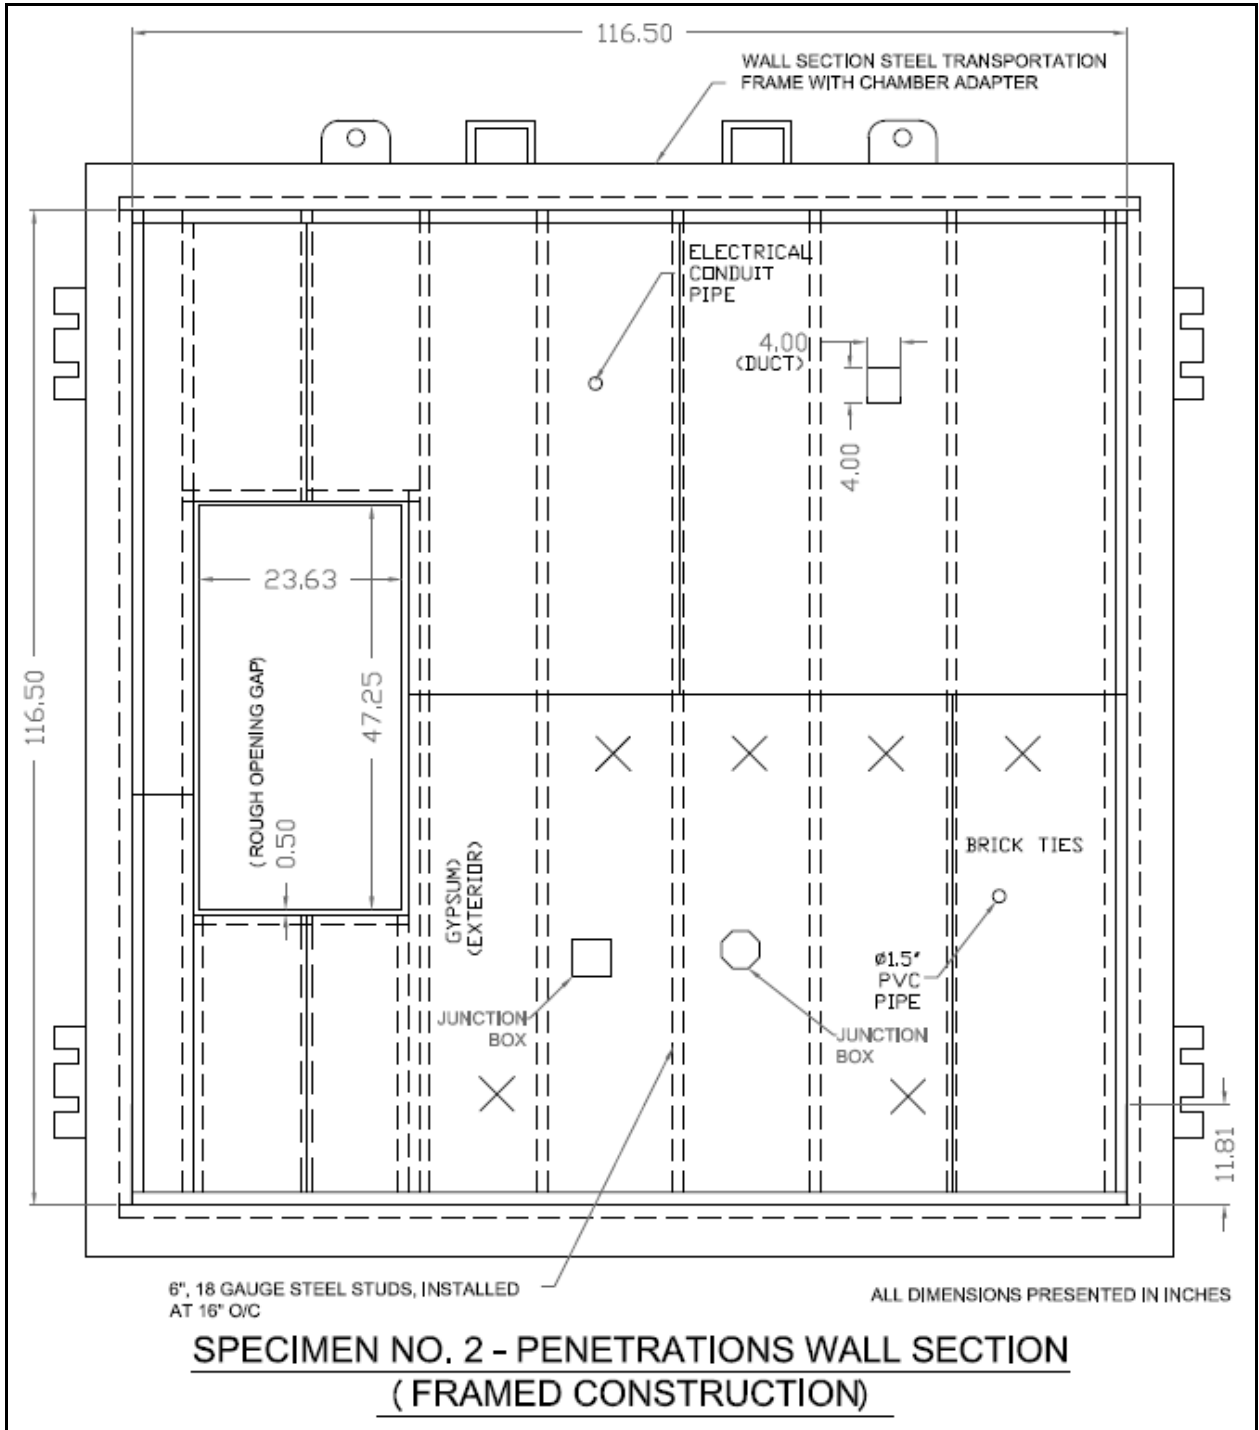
Element Specimen 20-06-B0040-SS-PT-2 Gauge Locations
